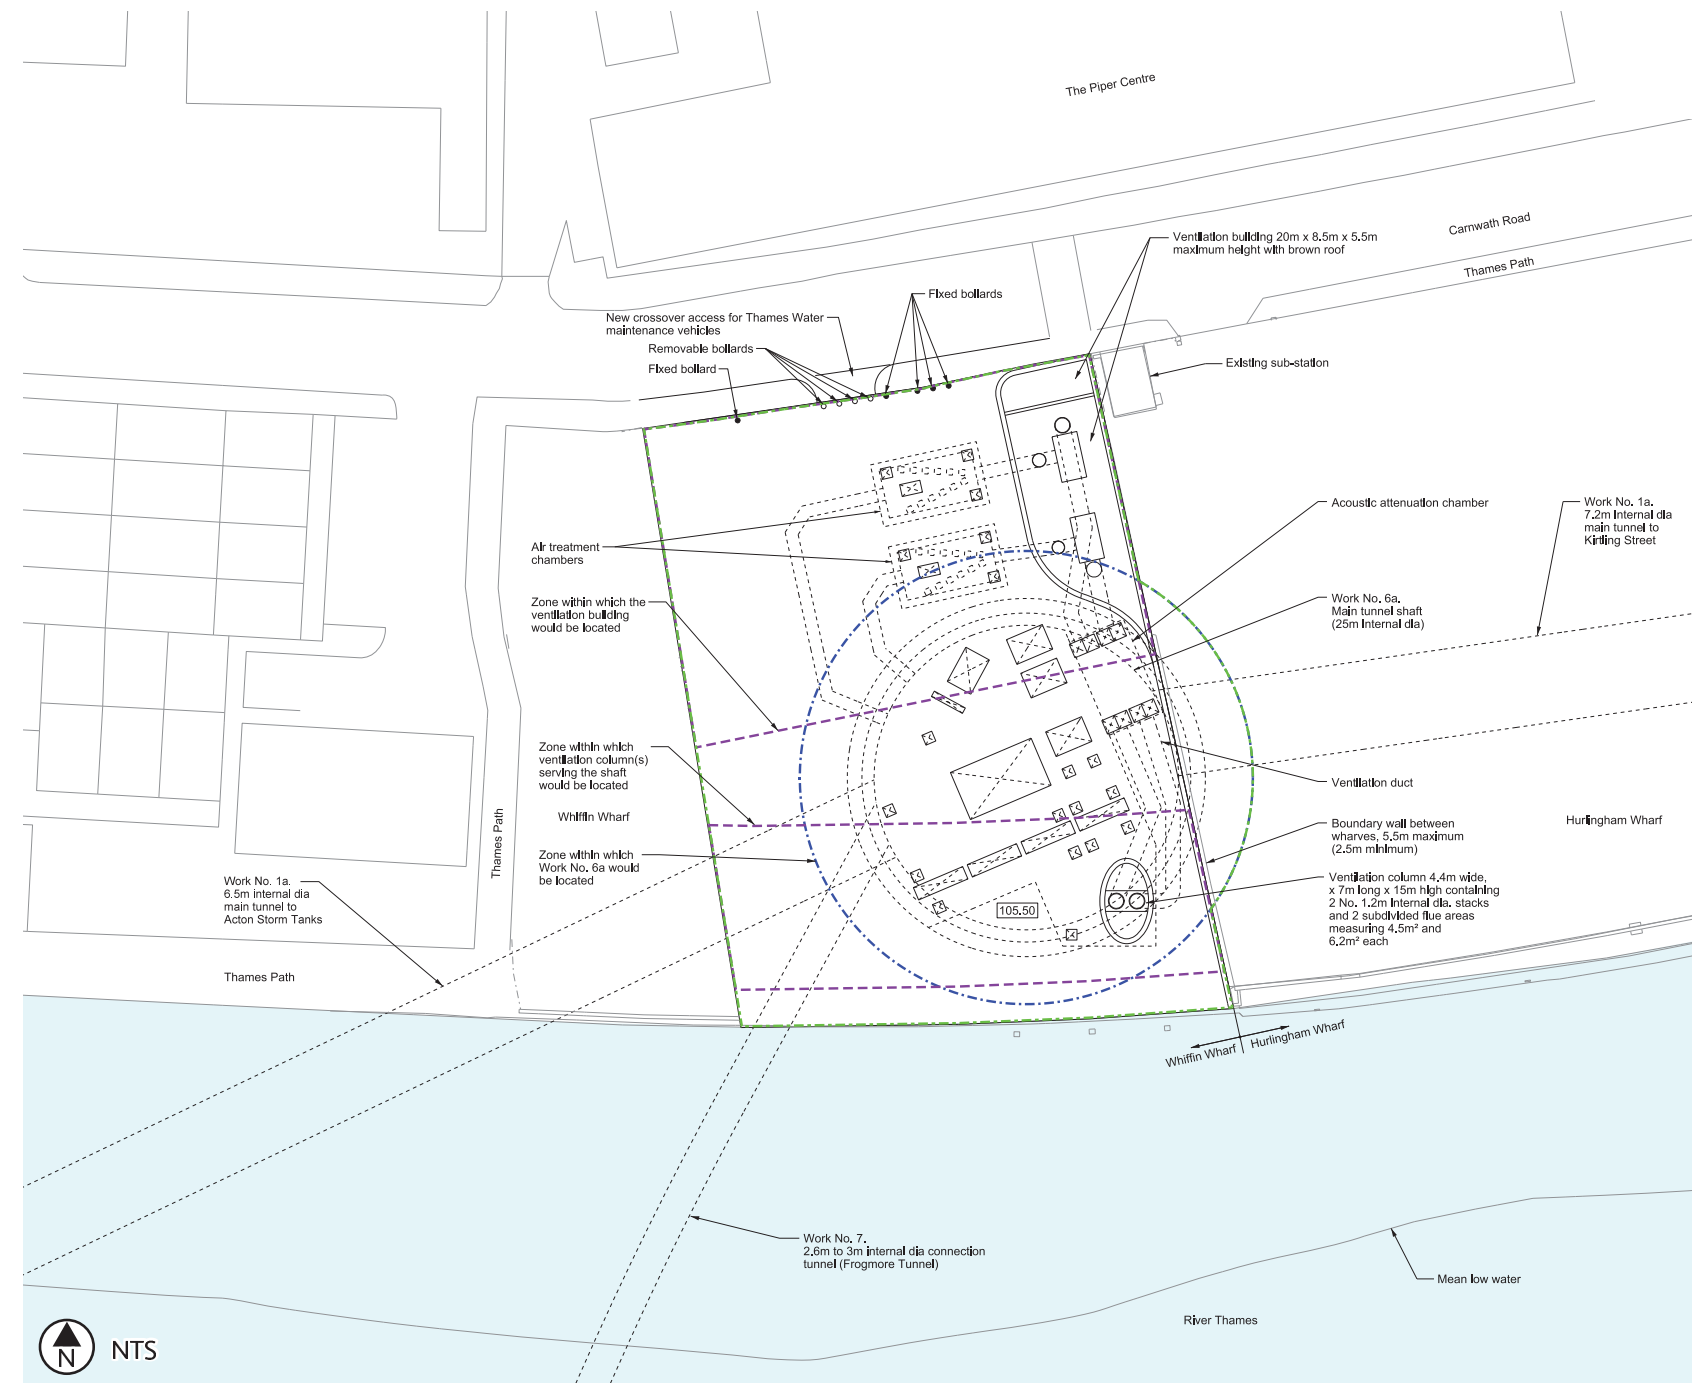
Permanent works layout plan - refer to Permanent works layout in the *Book of Plans
